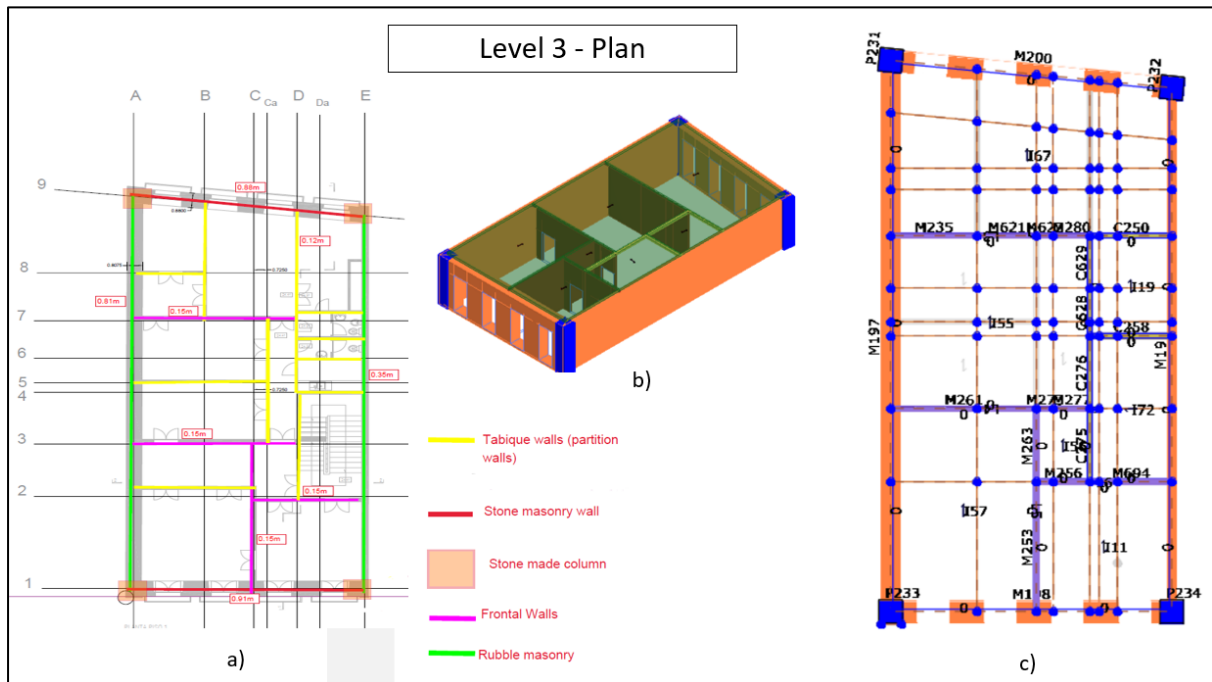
Level 3, a) floor plan previously marked up following the site survey , b) 3D model in 3Muri, c) floor plan in 3Muri showing the different type of materials as per a)
